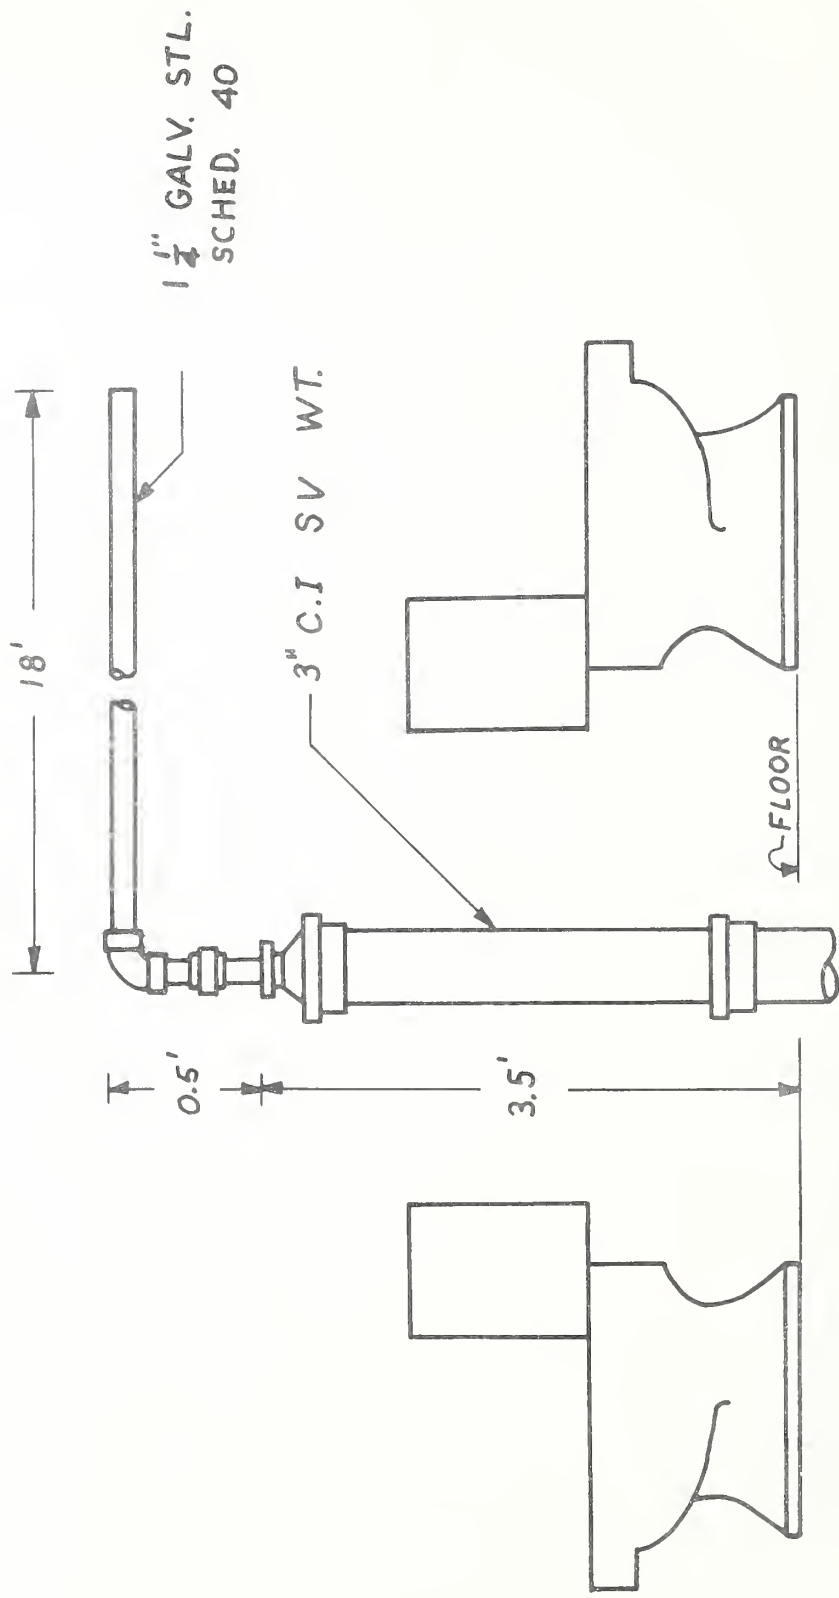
Test installation details for main vent using a 18-ft. length of 1-1/4-in. steel pipe
